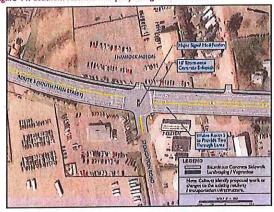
Southern Alternative 3 (S-3) Abbe Road Inset
